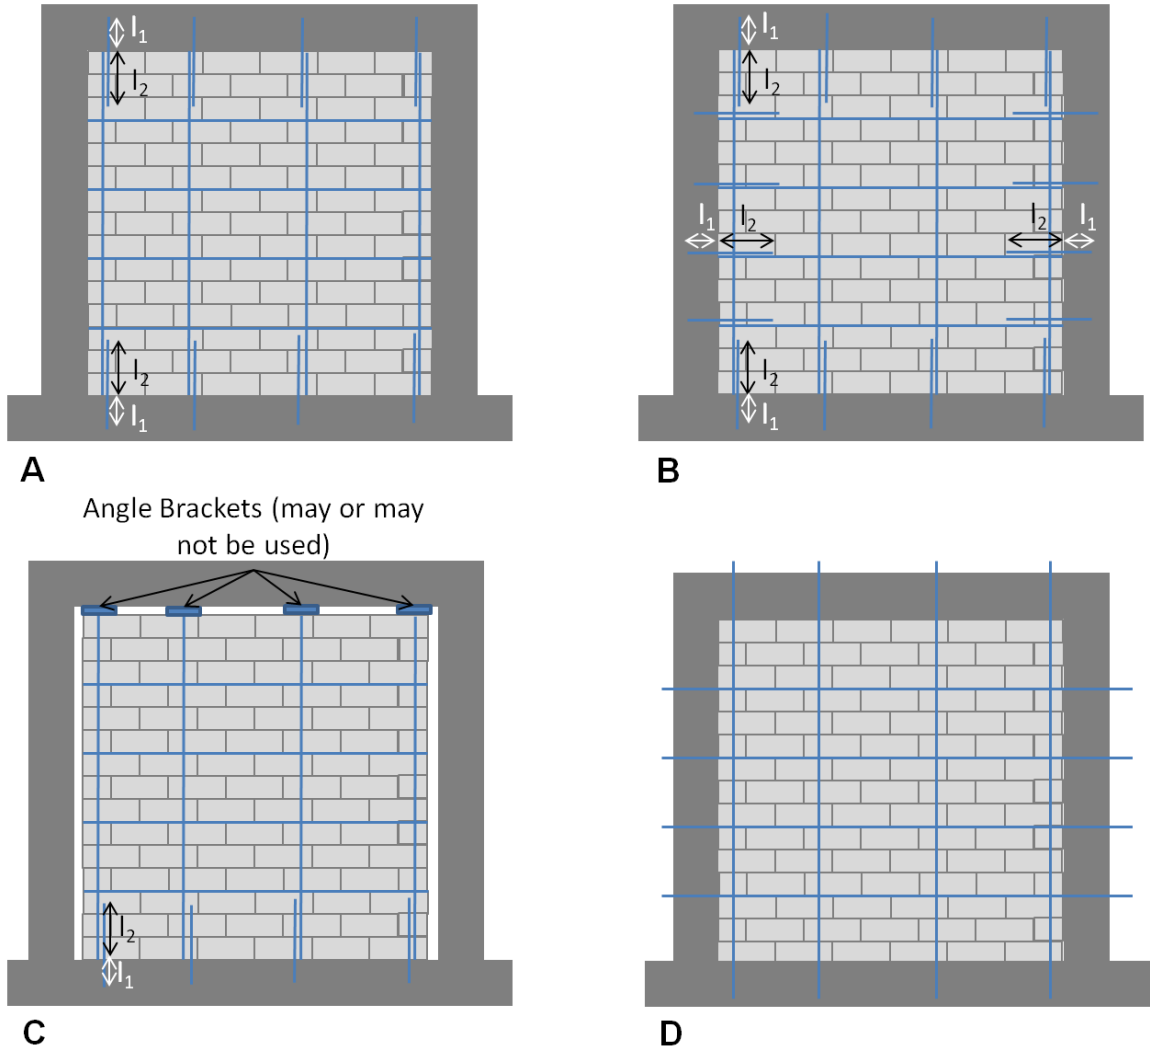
Methods for connection of the reinforced CMU wall to the concrete frame
